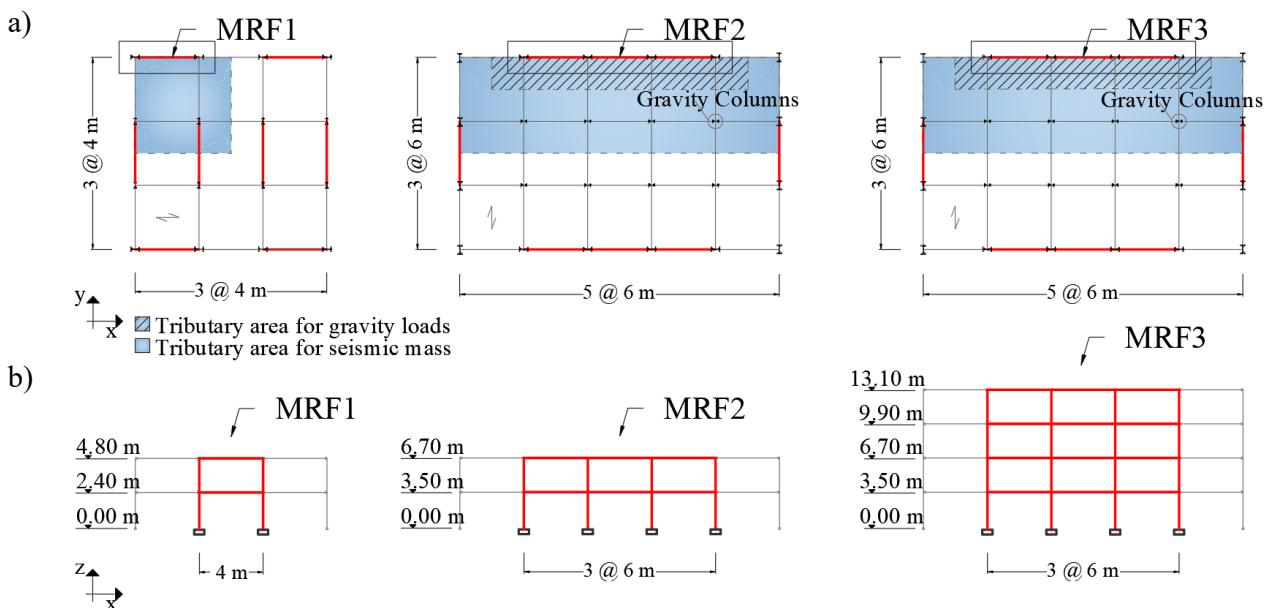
Case-study buildings: (a) Plan views; (b) Elevation views.
